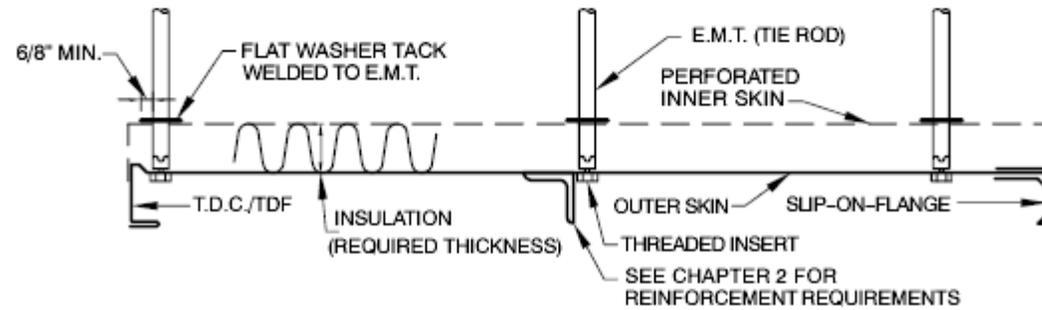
DOUBLE-WALL DUCT DETAILS
